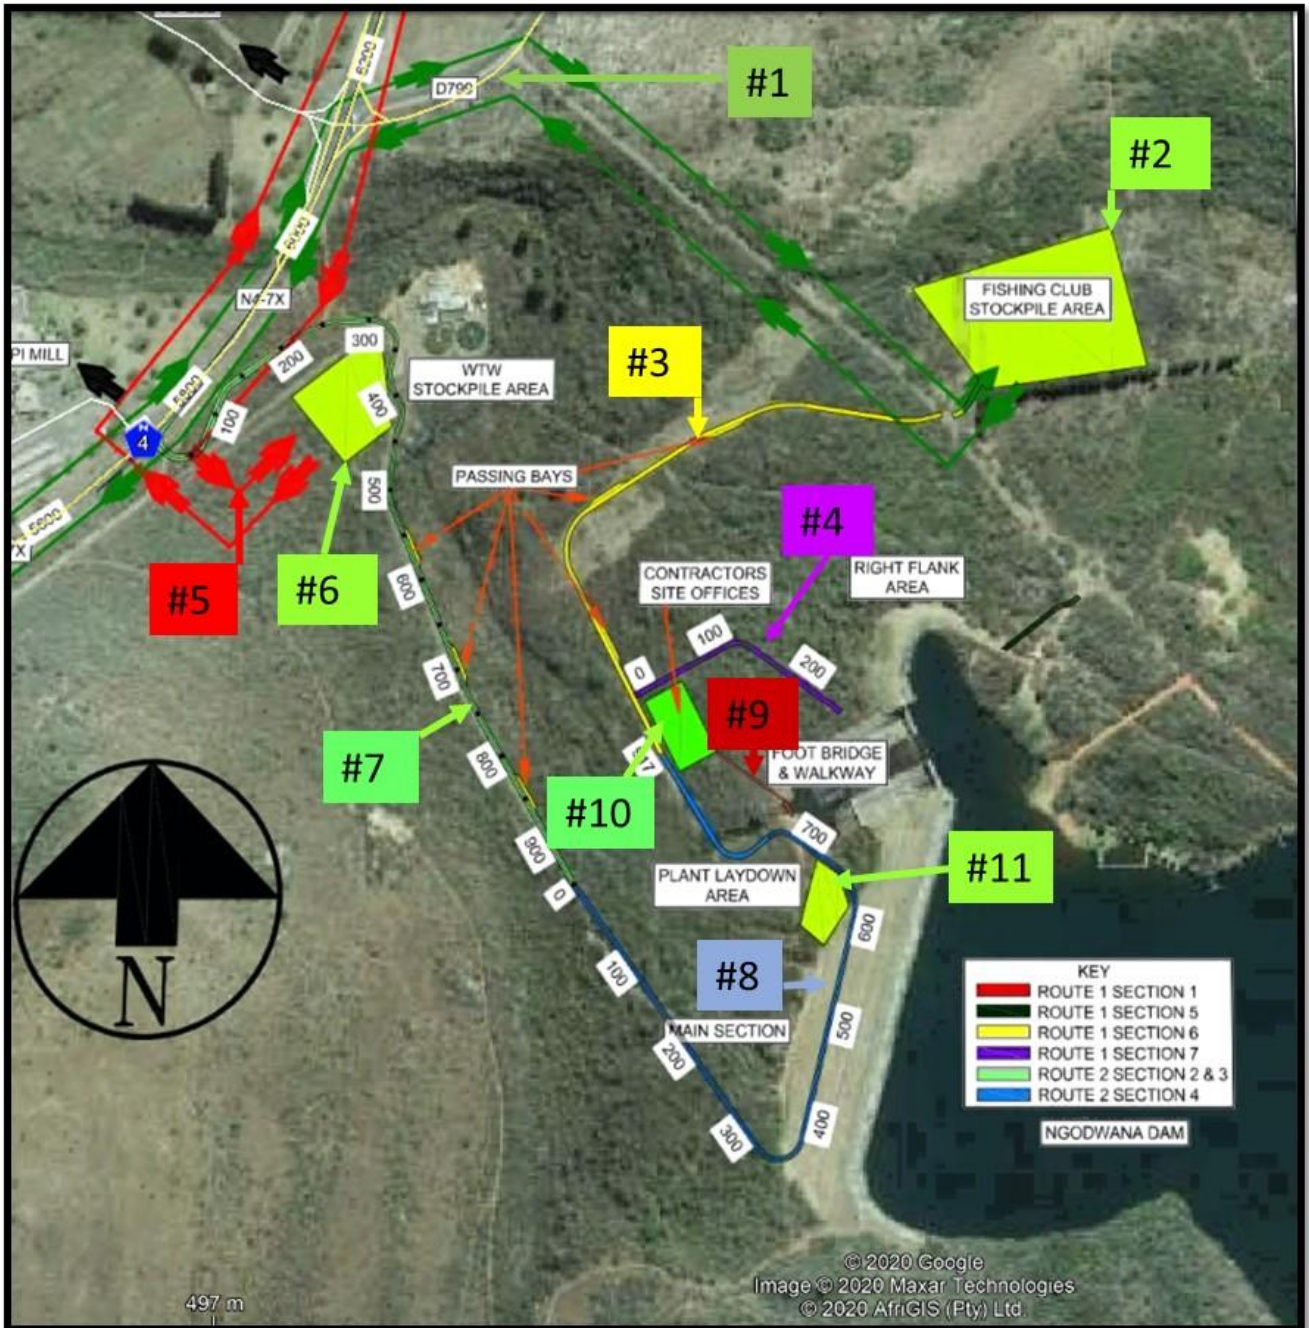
The proposed Ngodwana Dam rehabilitation infrastructure setup, highlighting haul road routes to areas.
